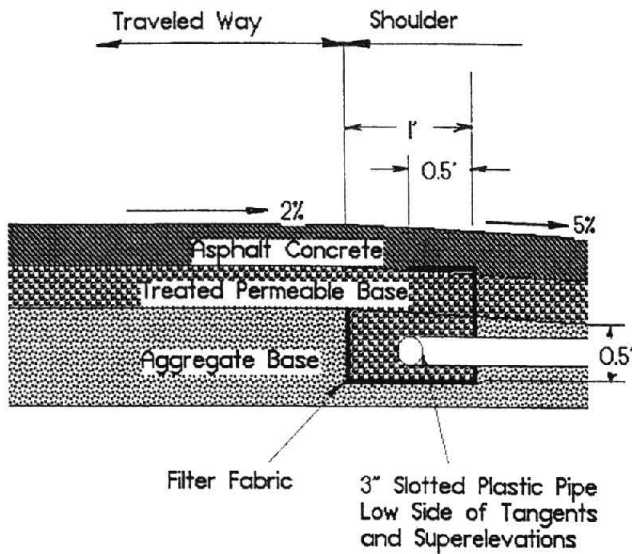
Flexible pavement internal drainage detail (from *Highway Design Manual*, California Department of Transportation, Sacramento (1990).
